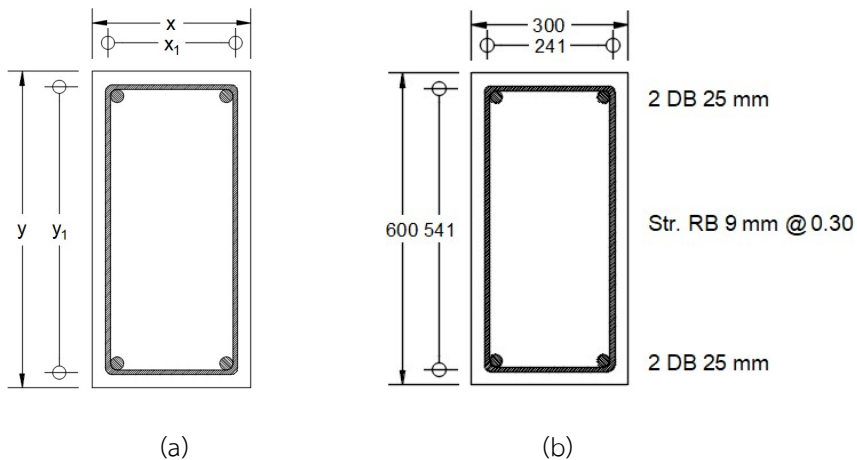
Reinforcement detail for stirrup and longitudinal rebar: (a) typical section and (b) selected example.
